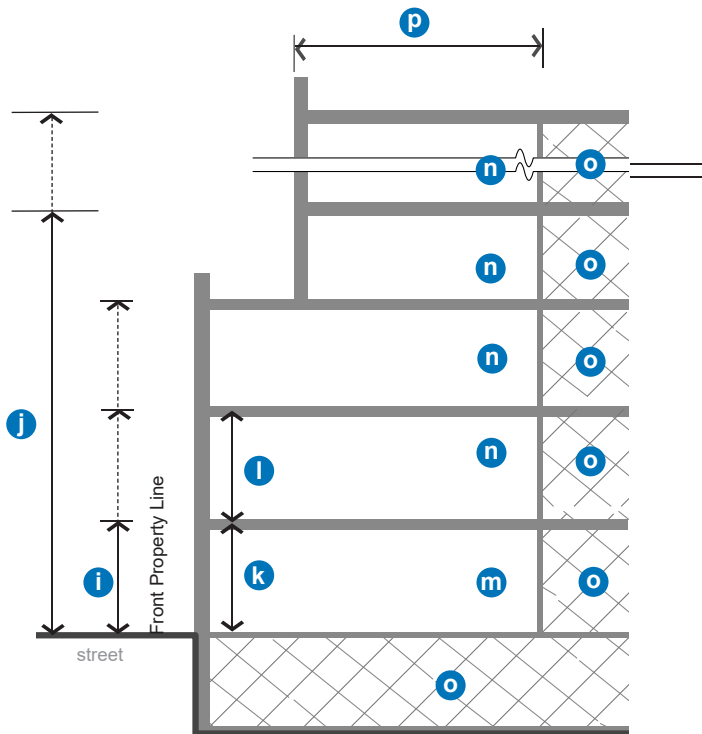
(2) General Stoop Building: Height and Use Requirements
